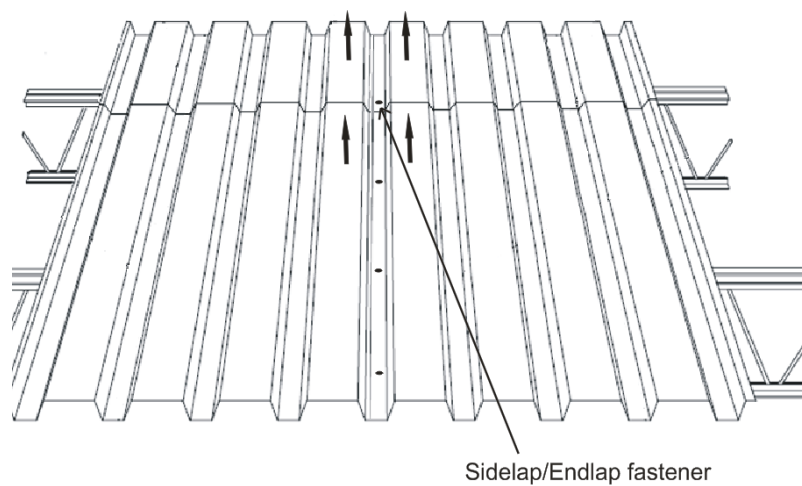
Schematic of tension forces acting on a sidelap/endlap fastener
